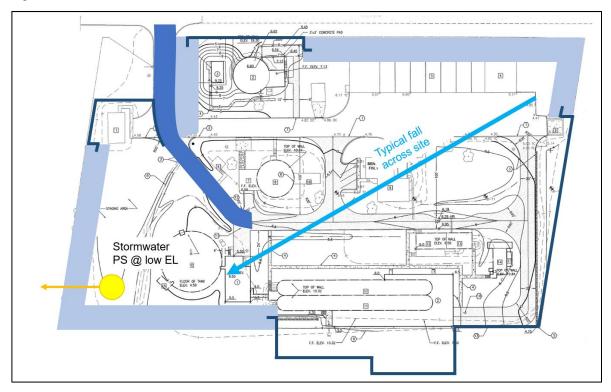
Option 1, Stormwater Discharge Pump Station Concept Arrangement, Plan View
